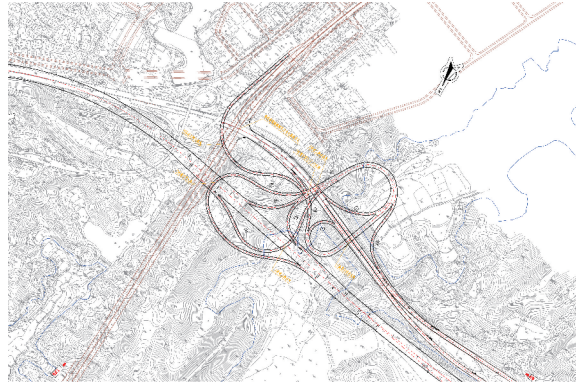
Layout plan of K-line Zouma Interchange (Option 6)
